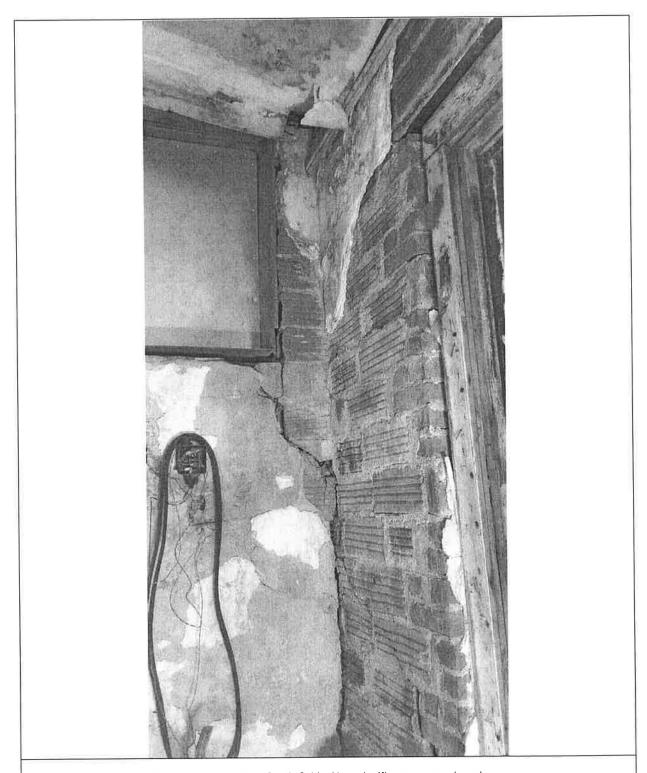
East End of Interior Bearing Wall below South Gable: Note significant structural cracks.
